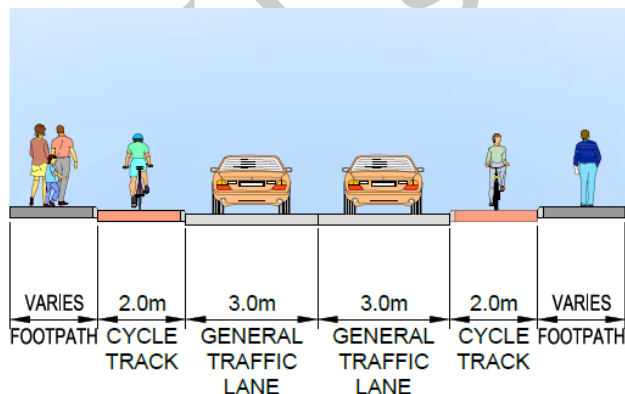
Section 2C, Proposed Option 2 – Cross Section B-B
